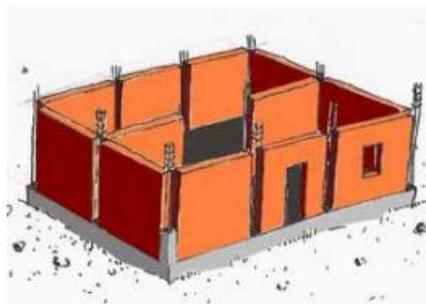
Confined masonry building under construction (Source: T. Schacher).
